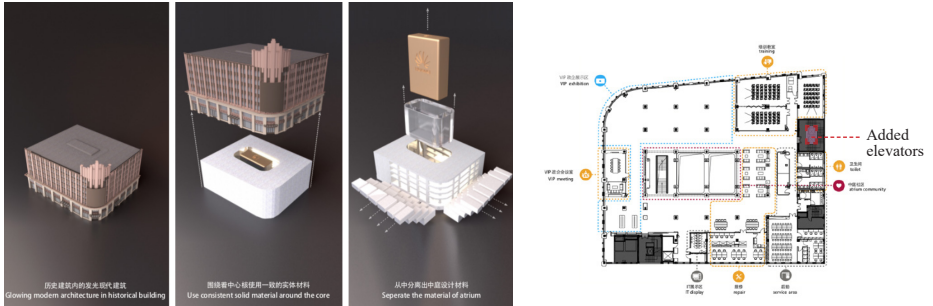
a) concept analysis; b) ground floor plan with added elevator.
